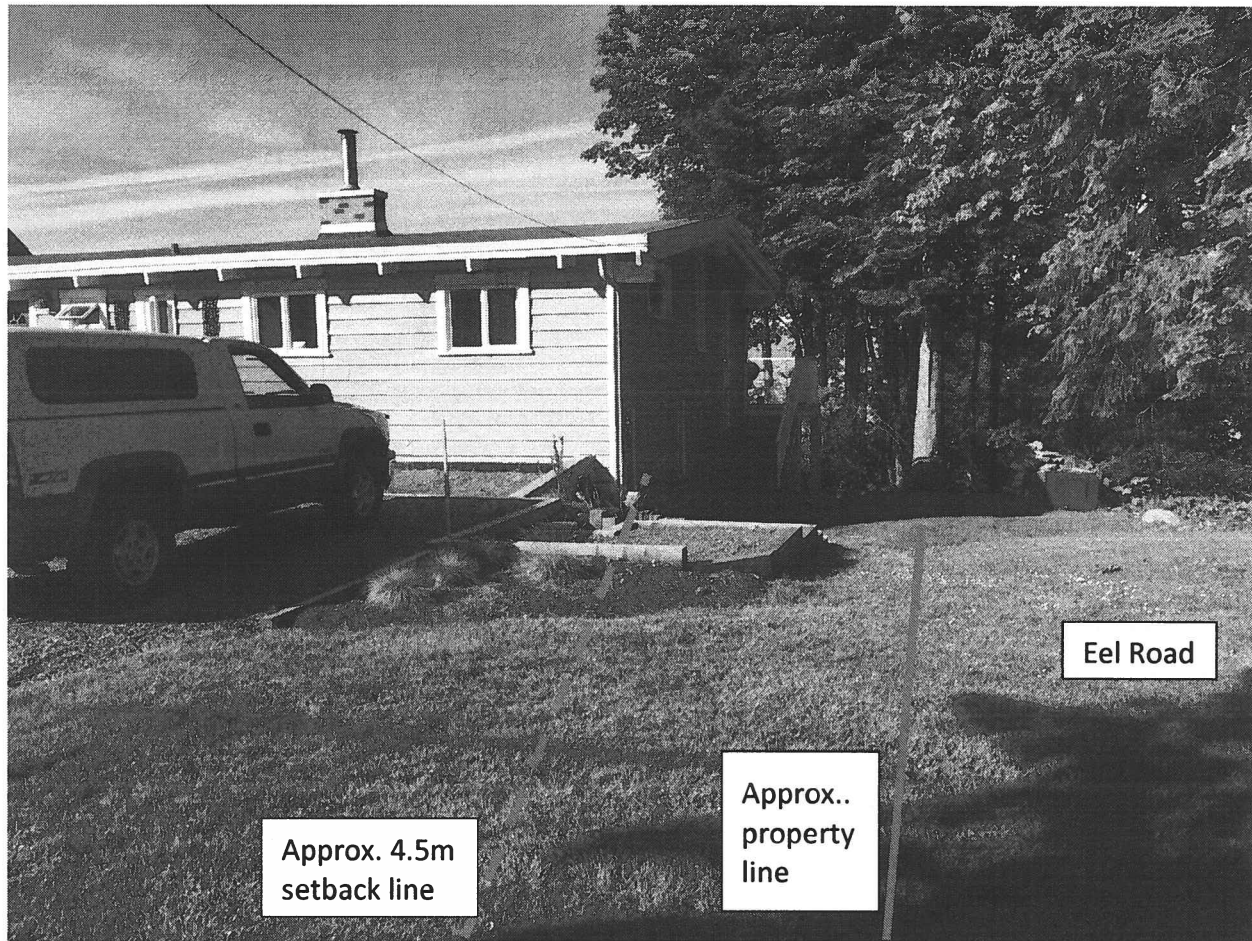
This photo of the south side of the property illustrating the rear corner and deck of the existing 1961 house extending into the setback area against Eel Road. The new house will be kept out to the setback area and the new deck/veranda will extend into the 4.5m setback space by only 1.75m, less than the current deck.
